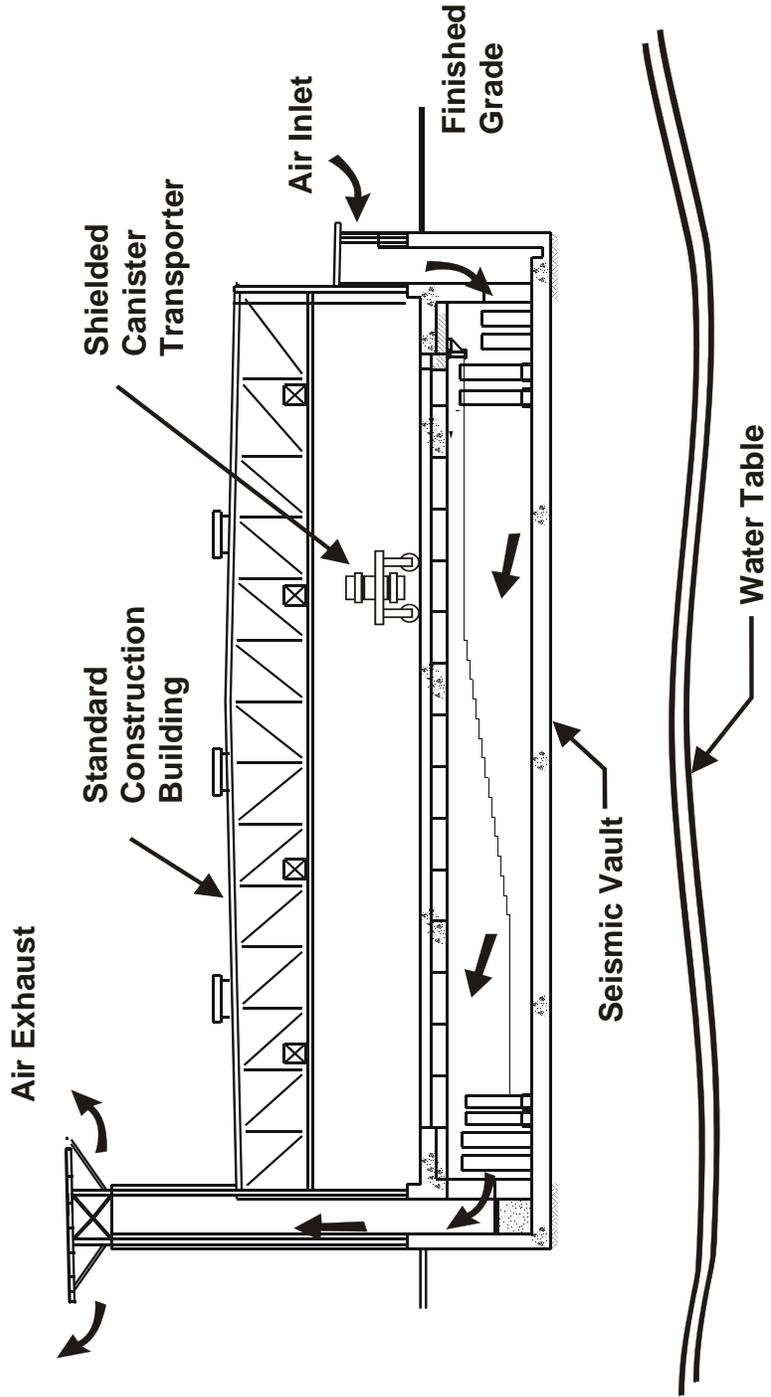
Glass Waste Storage Building # 2 Cross Section
